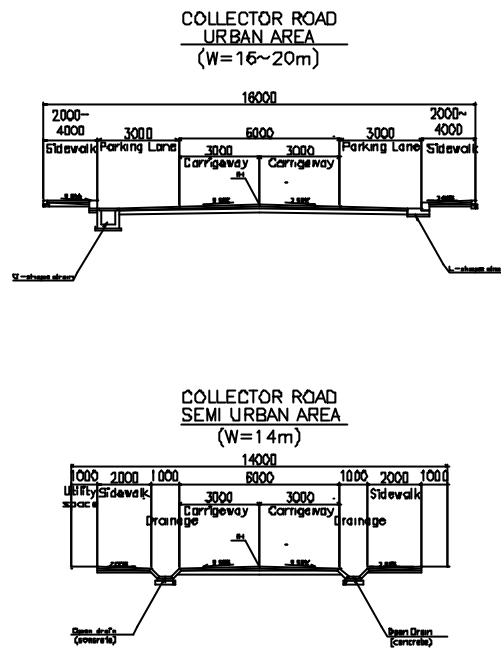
(2) Proposed Typical Cross-sections (Collector Roads)
